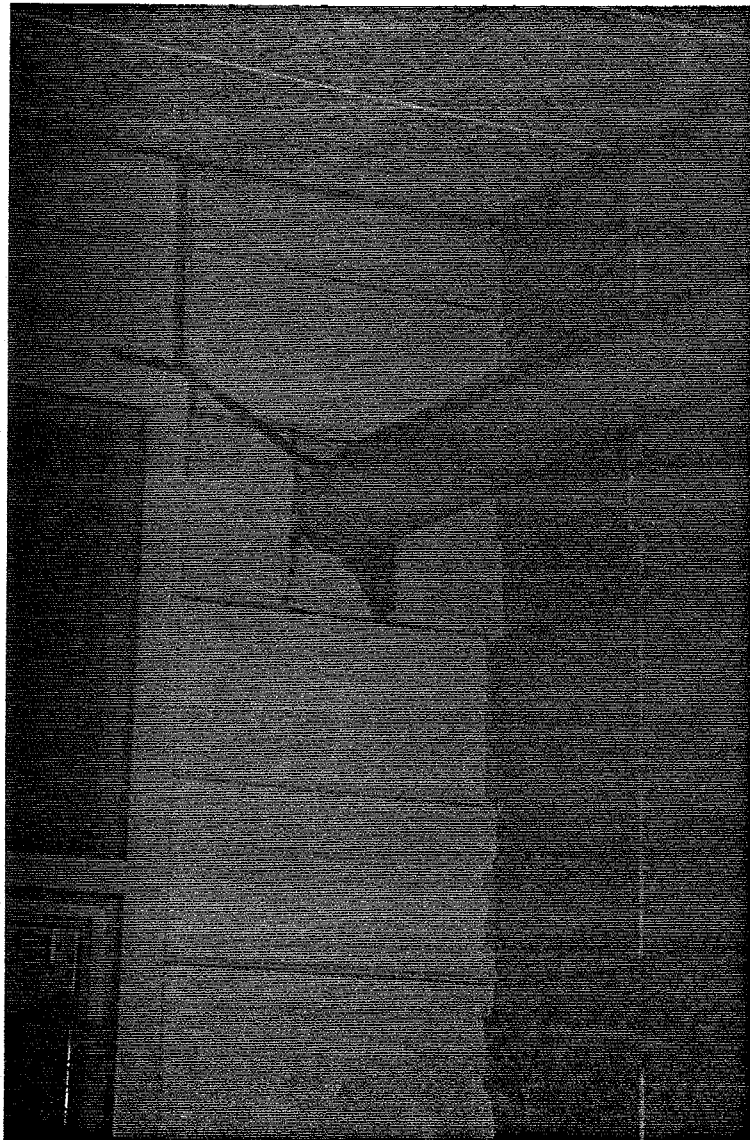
Cracking of interior masonry walls at joint between interconnecting corridor and older wing.
